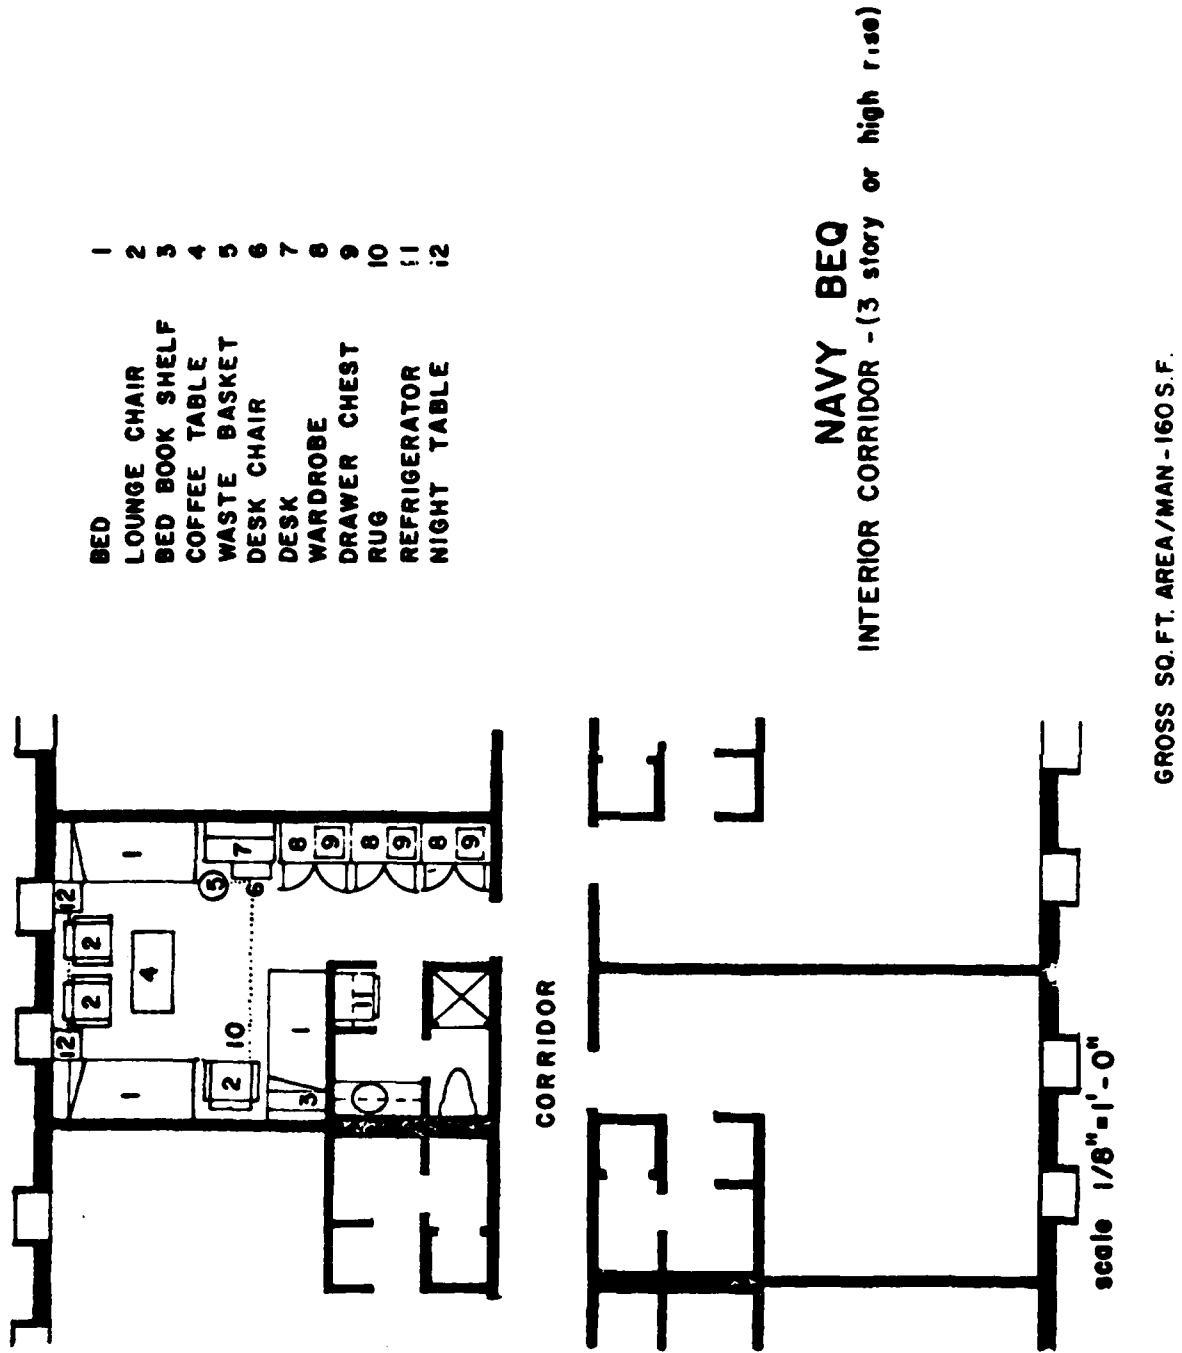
Interior Corridor Design Barracks, Navy BEQ, Room Layout
